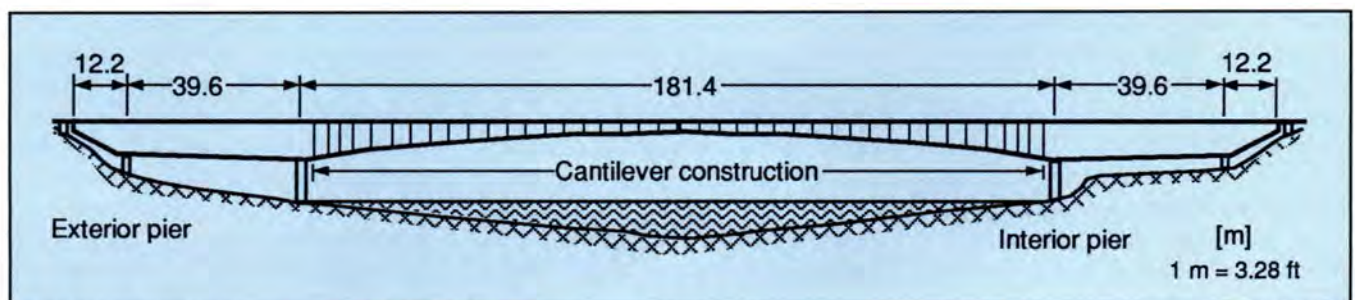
Longitudinal elevation of the Grand-Mère Bridge.
